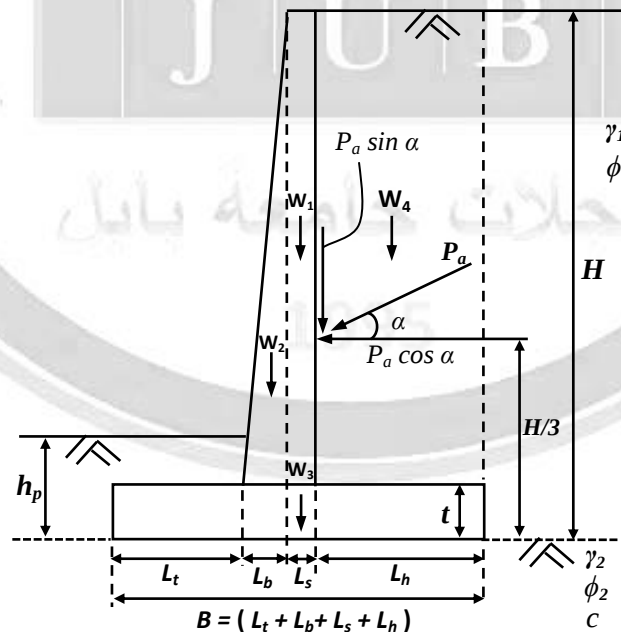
Forces acting on a reinforced concrete cantilever retaining wall
